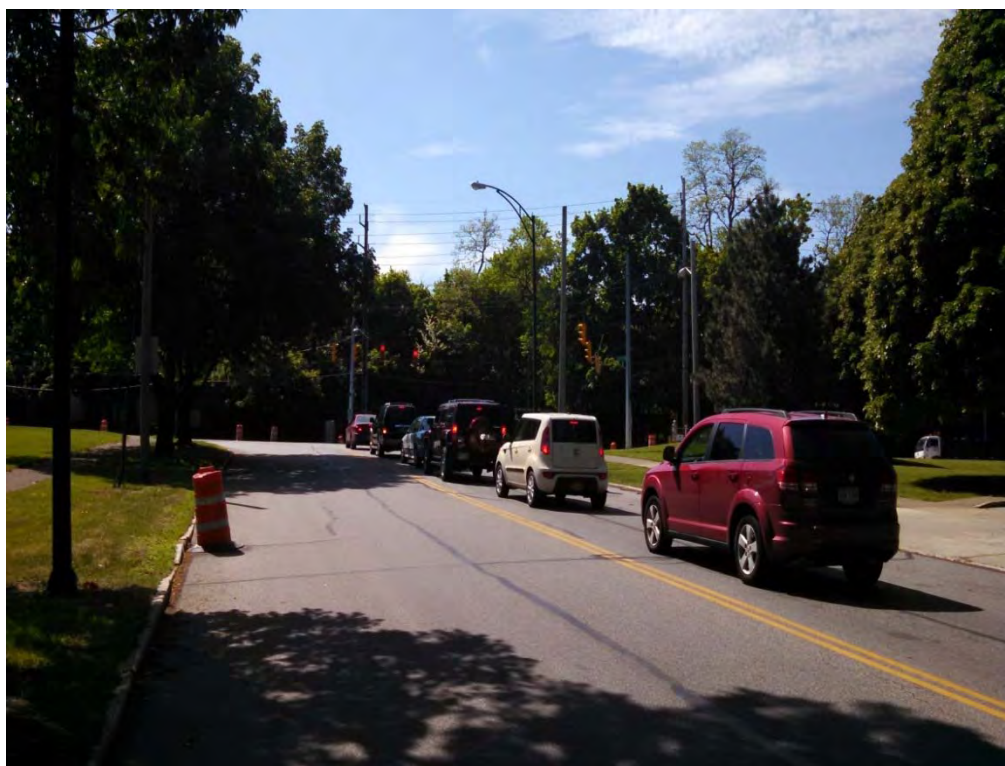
Typical road ROW along Monticello Boulevard within the project area.
